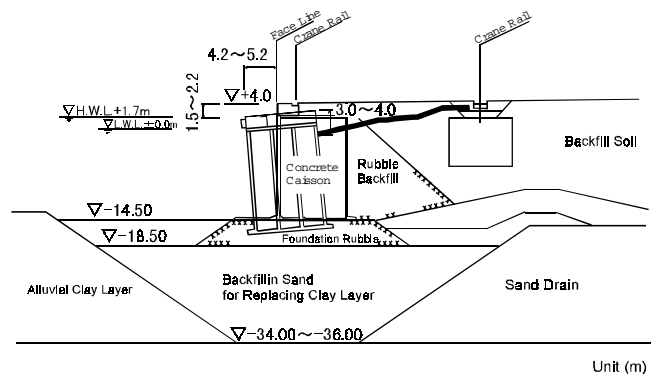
Cross section and deformation of a quaywall at Kobe Port (RC-5, Rokko Island)
